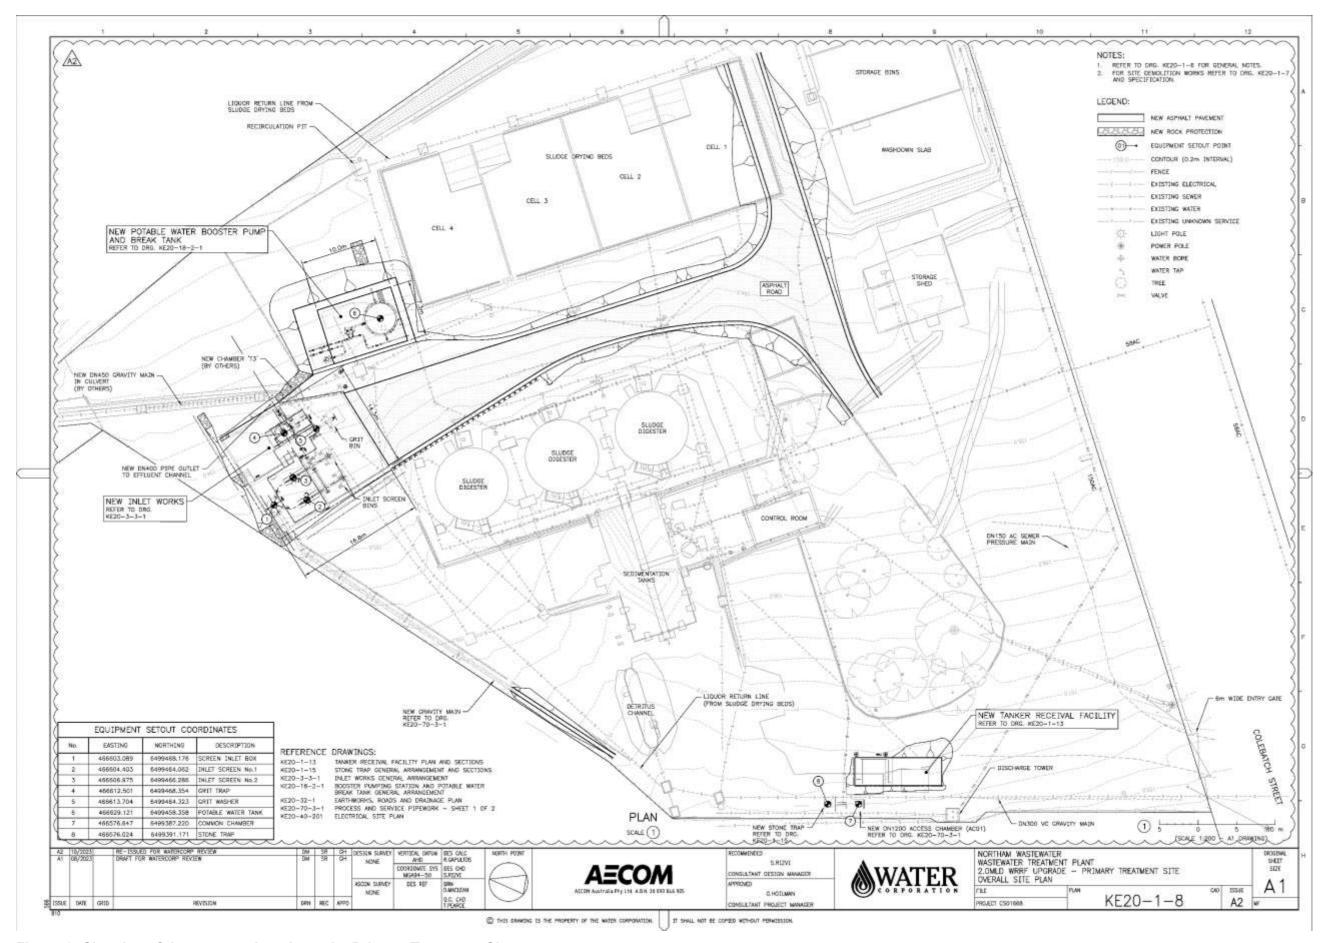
Site plan of the proposed works at the Primary Treatment Site
